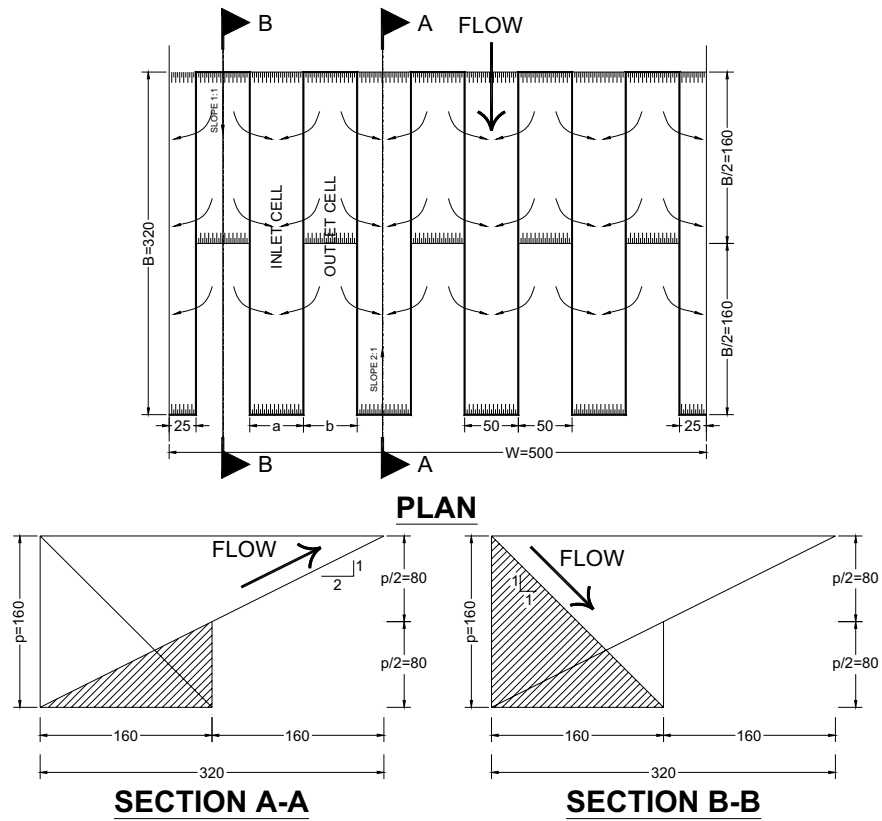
Plan and section of model P₄M₁ (both sides ramping), (dimensions in mm)
